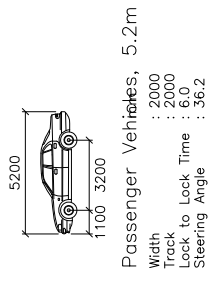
Passenger Vehicle Exiting the Parking Spaces and the Underground Garage (Building A&B)
